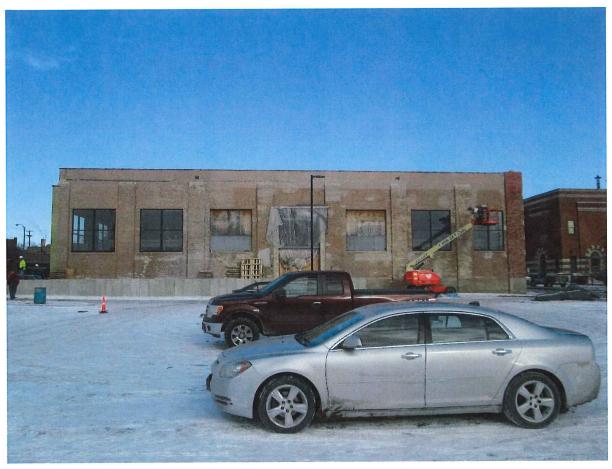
South elevation of building, January 2018. Photograph courtesy of Dave Peltier.
